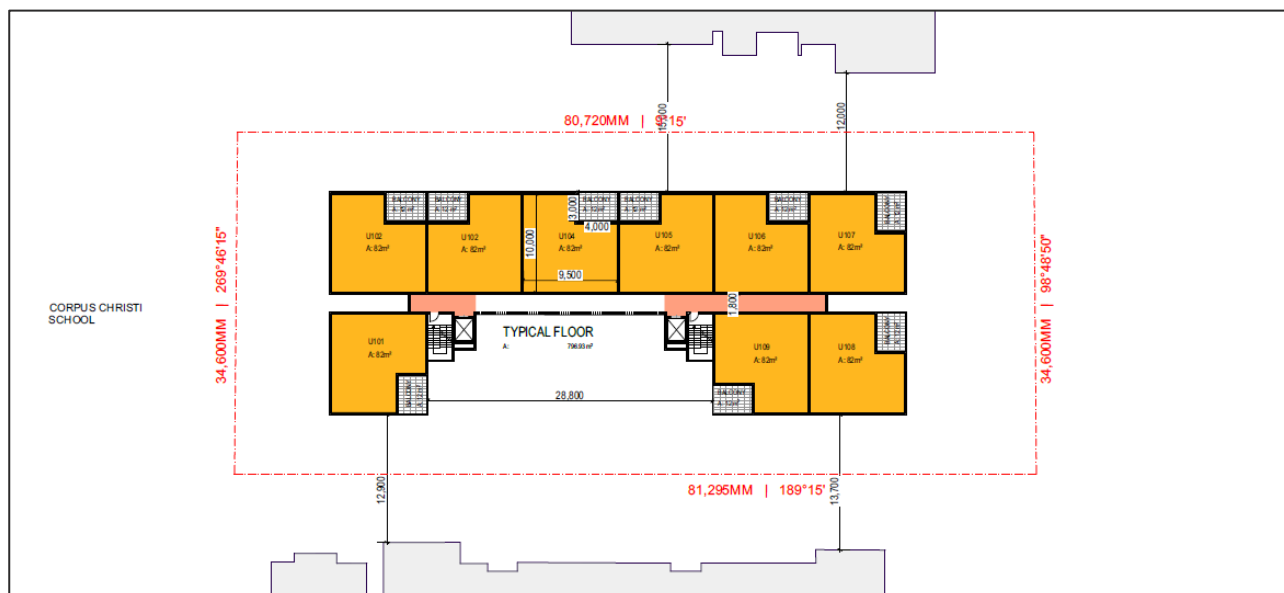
Proposed typical floor plan (Source: mackenzie architects concept architectural plans)
